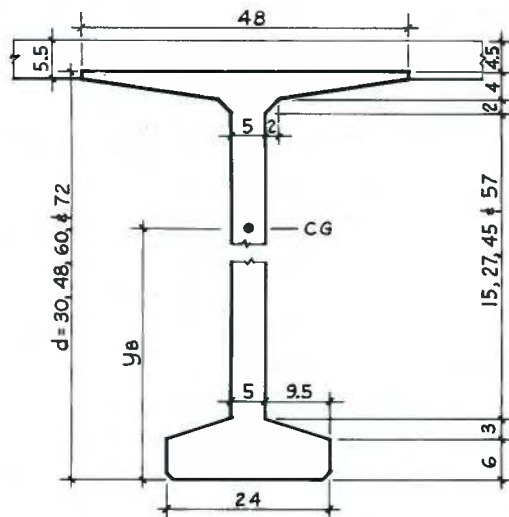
Section of a CEC standard decked bulb-T bridge used extensively for county and forest roads.
